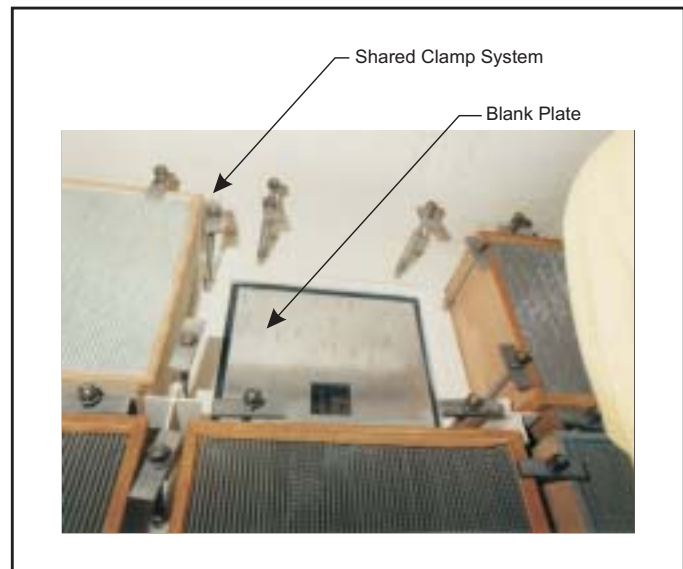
HEPA Filters Mounting Frame with Blanking Plate Installed for Filter Change
